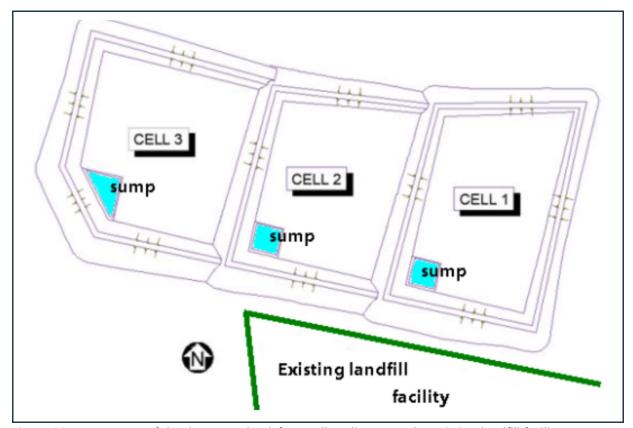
Layout map of the three new land-farm cells, adjacent to the existing landfill facility.
